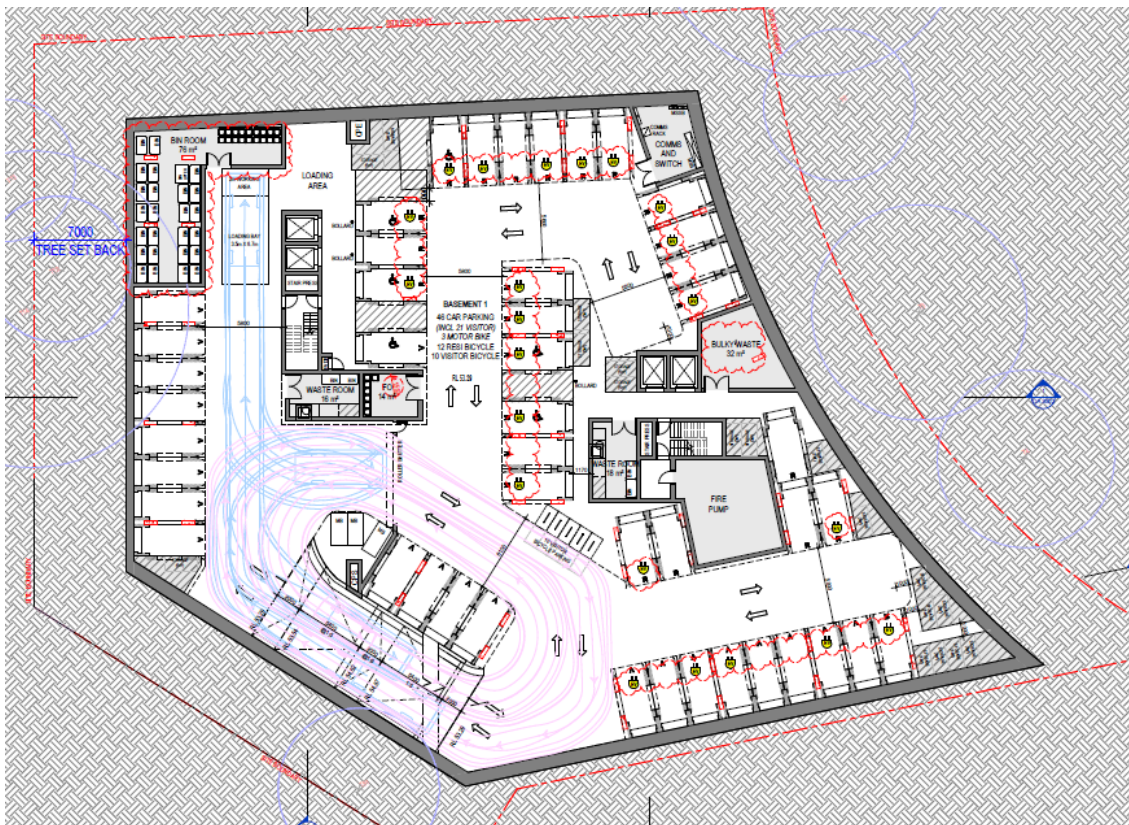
Basement Level 1 (Source: Amended Architectural plans)
